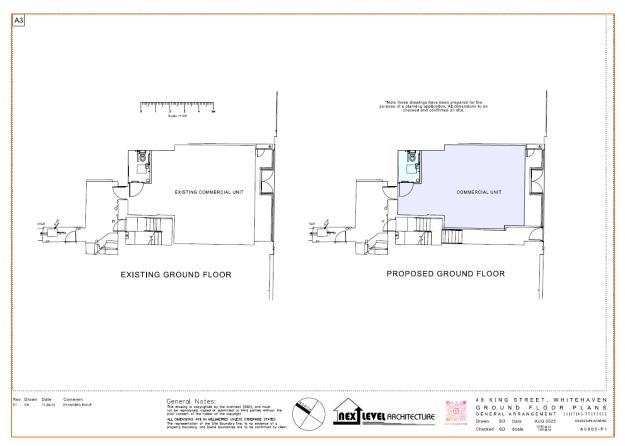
Existing and proposed ground floor plans (Source: Next Level Architecture)
